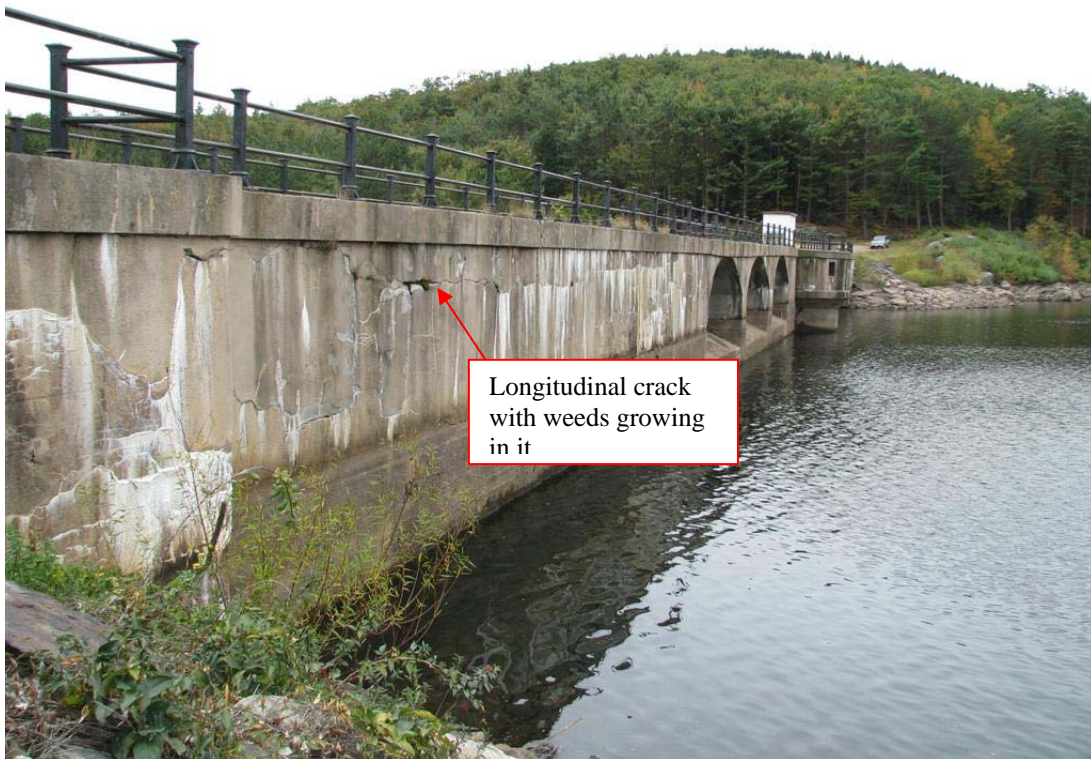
Cracks and efflorescence on upstream face of dam. Note that some weeds are growing in the cracks.
